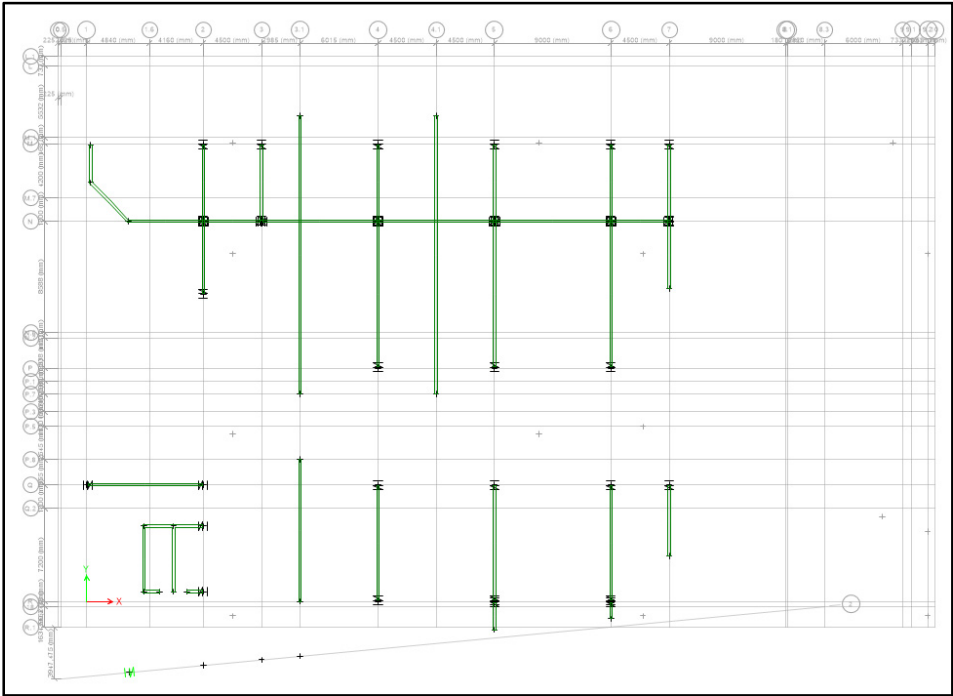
Plan view of masonry walls in the 2nd floor
